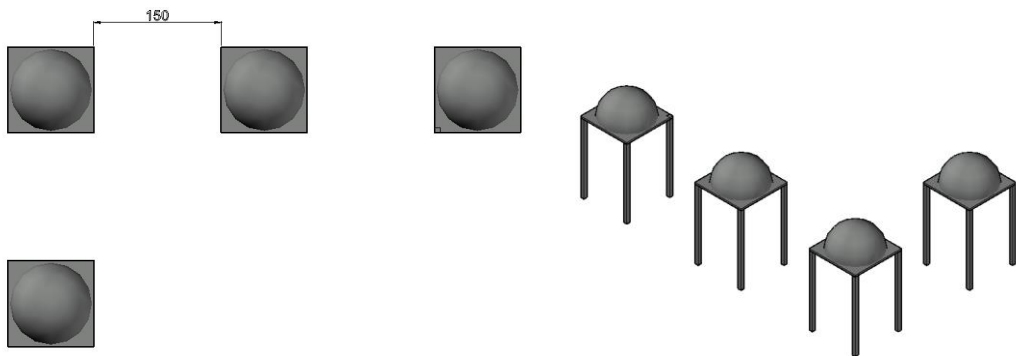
8 Plan and Isometric view of arrangement of domical roof buildings in L shape at 50 mm spacing
